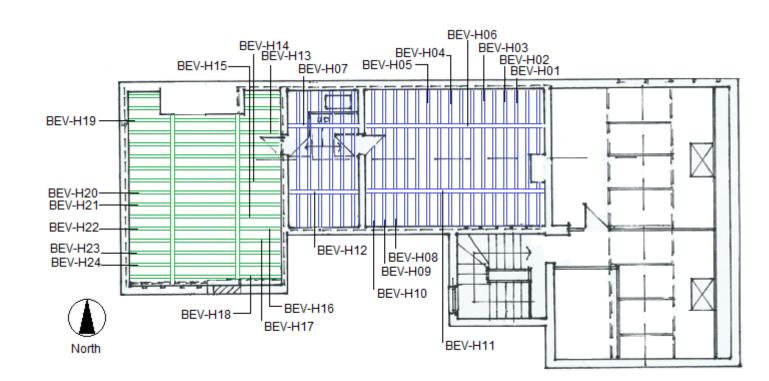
Roof plan, showing the location of sampled timbers BEV-H01–24 (after Chris Wooller)
